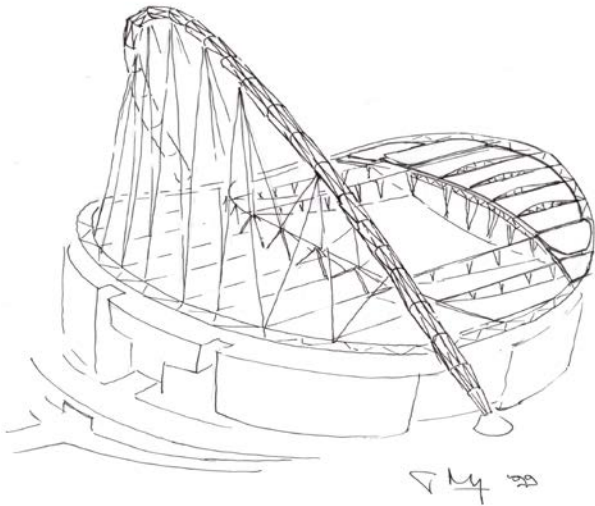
Early structural concept sketch of Wembley Stadium Roof
